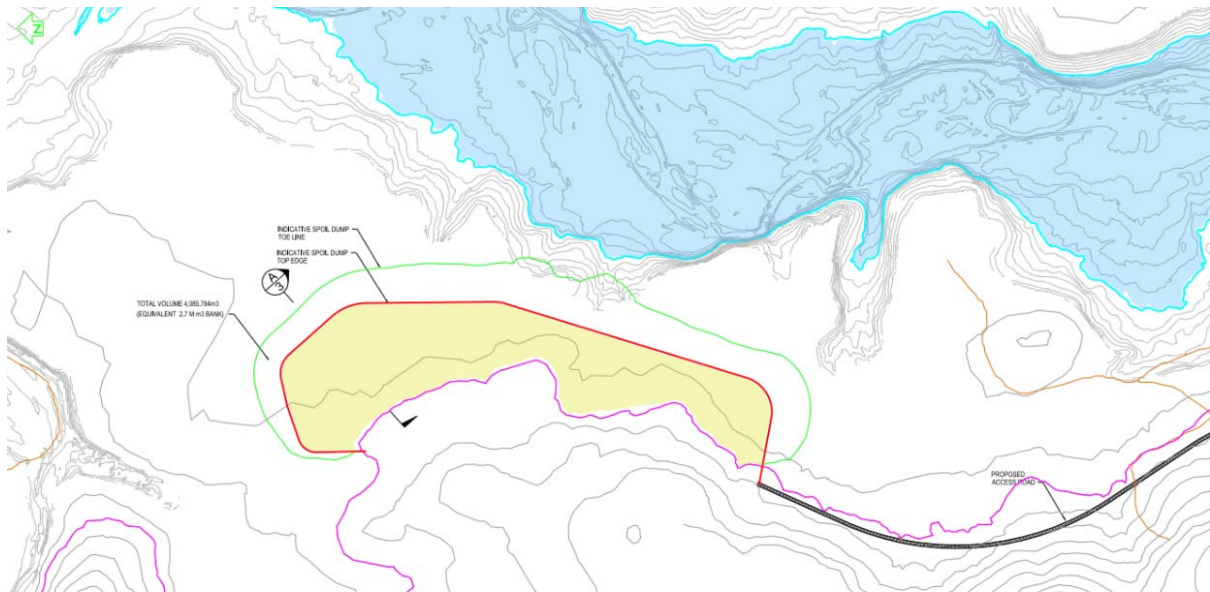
Tantangara finished excavated rock emplacement footprint
